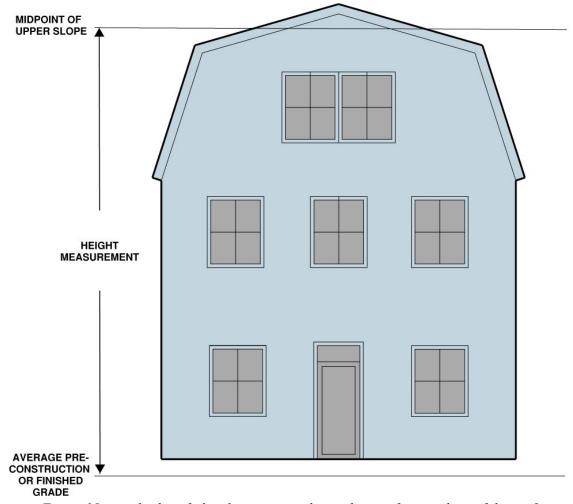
gambrel roof - height is measured to midpoint of upper slope of the roof
